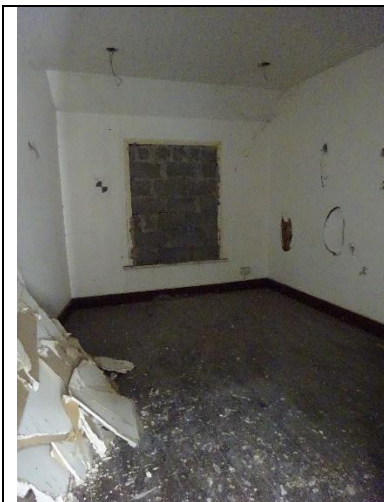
Second Floor front room with timber floor boards and blocked up window opening
